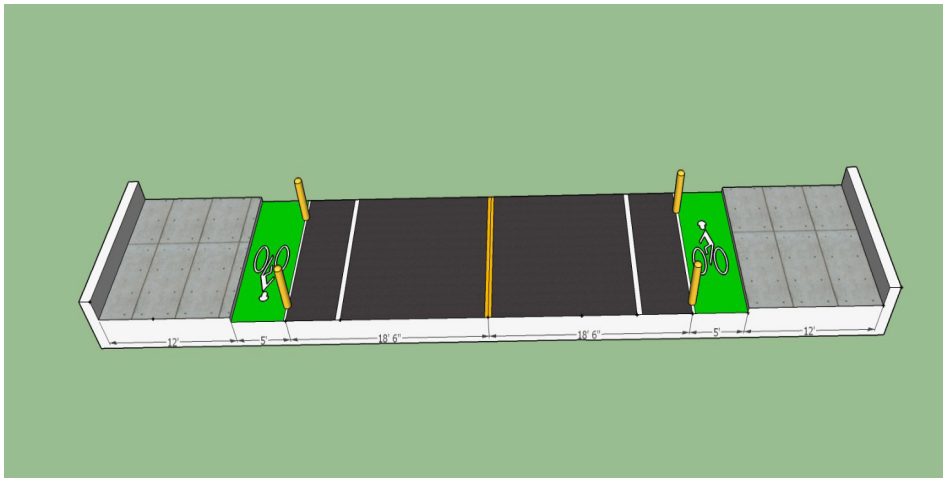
Proposed redesign of Cherokee Avenue bridge with painted and semi-protected bike lanes
